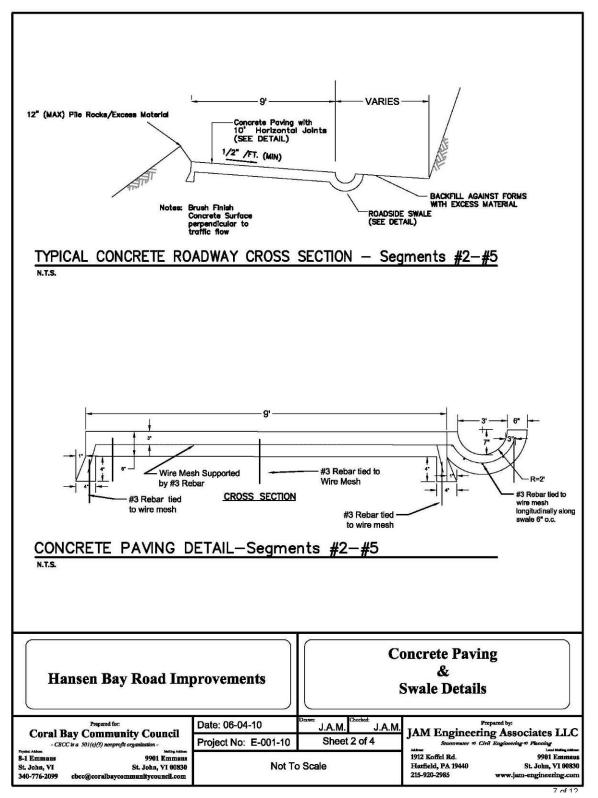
Segments #2-#5 Paving Detail and Segment #5 Swale Detail
